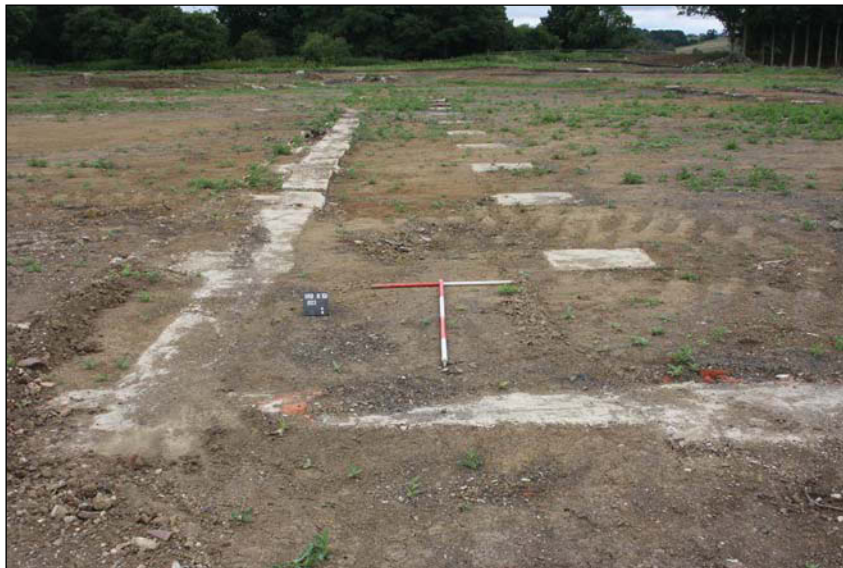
Building 3, looking south, Scales: 2m and 1m.
